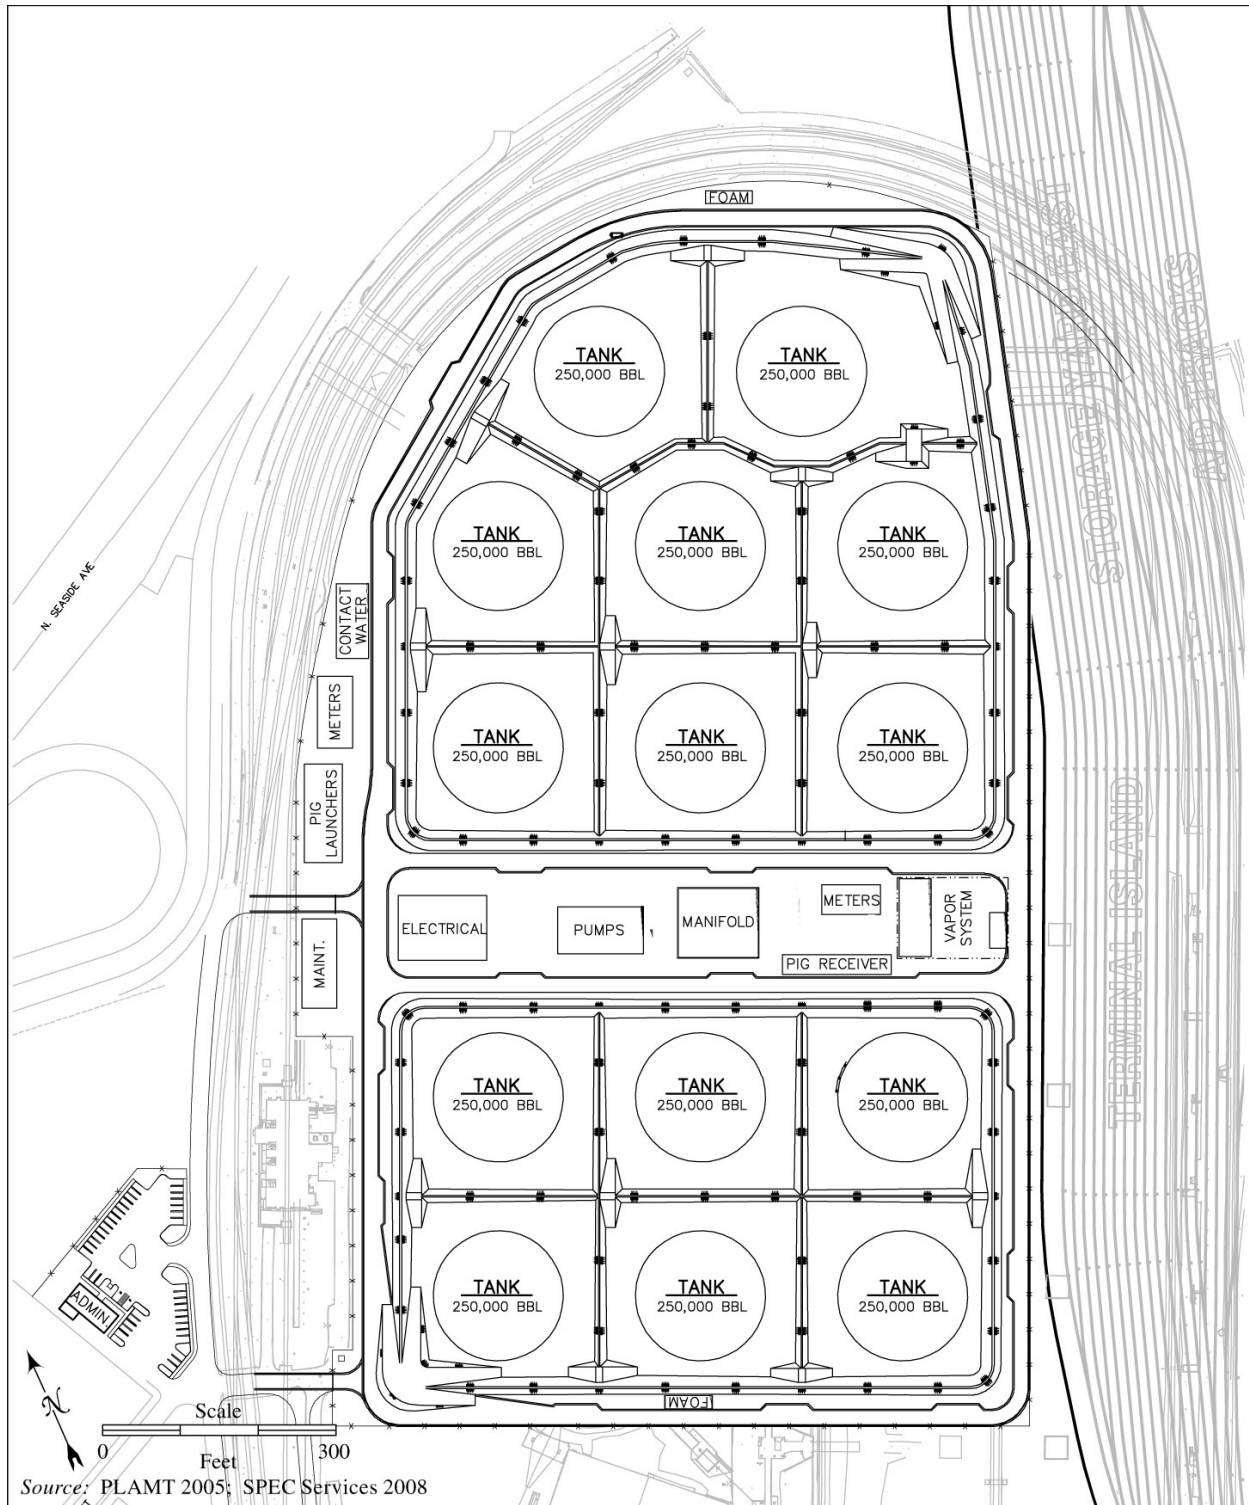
Proposed Tank Farm Site 2 (Terminal Island Tank Farm)
